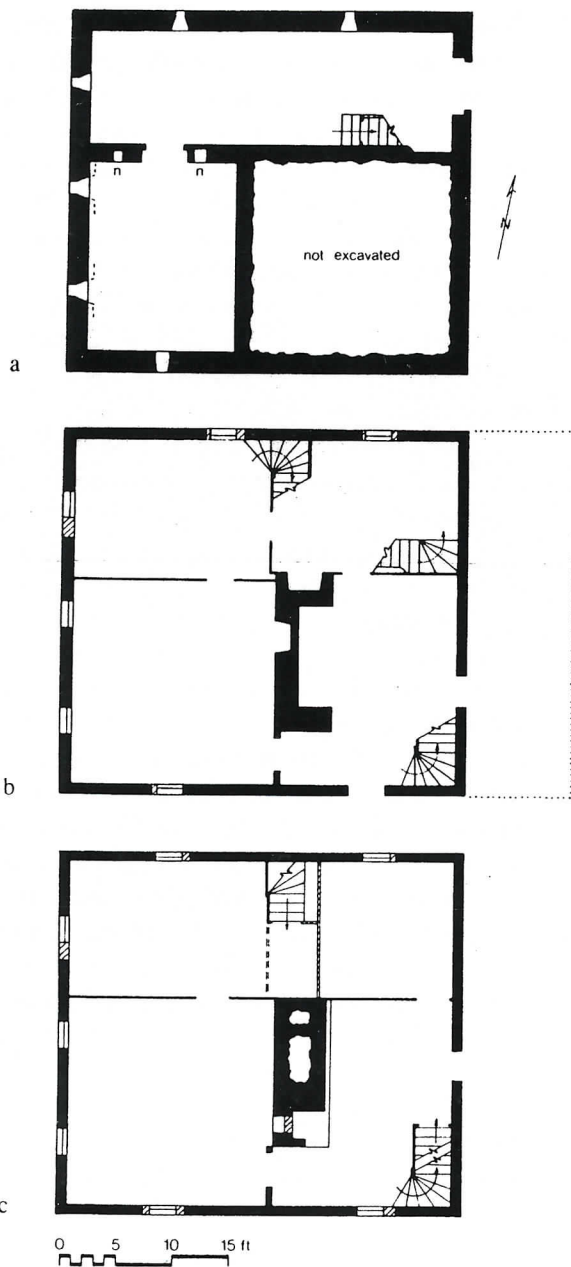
Cellar, first-, and second-floor plans of Fort Egypt. (1940 HABS plans revised by the author.)
